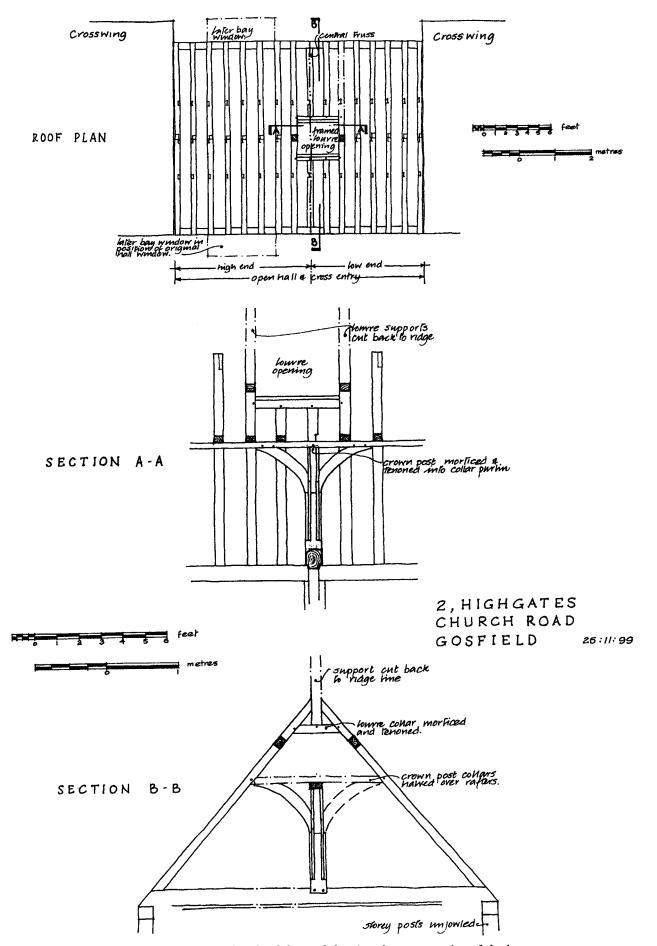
Gosfield, 2 Highgates, Church Road, details of the roof showing the construction of the louvre.
